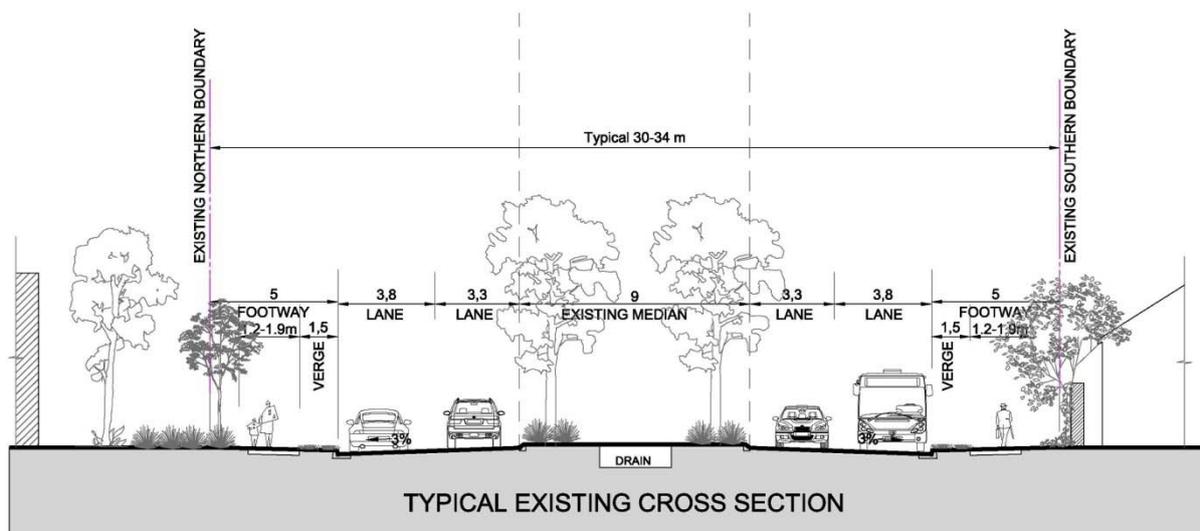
Typical cross-section of Norwest Boulevard, Sydney, Australia
